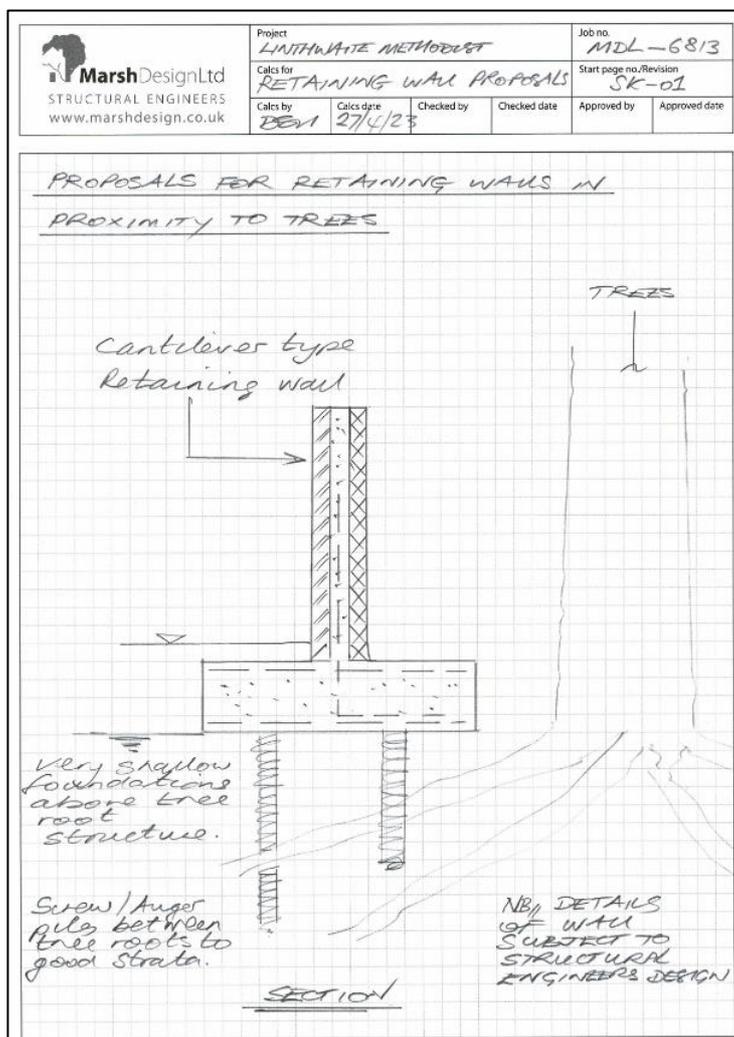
Proposals for retaining wall in proximity to T006 and T007
